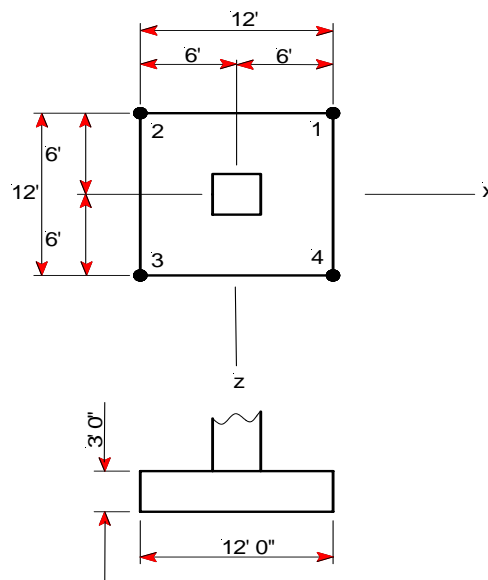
Plan and Elevation of Isolated Spread Footing Design
